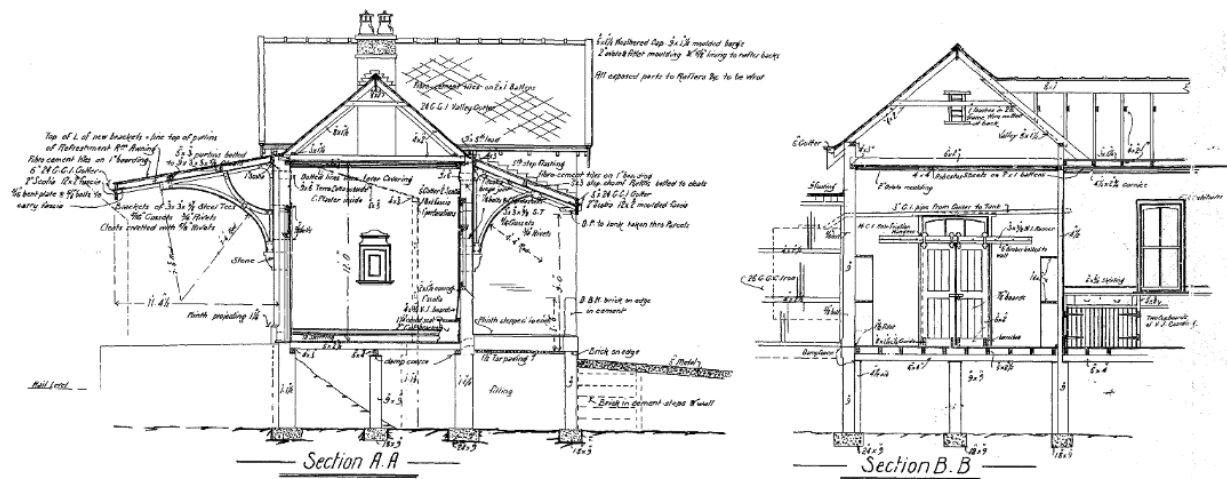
Narrabri Railway Station Sections, n.d. (Source: NSW Plan Room No D53/110)
